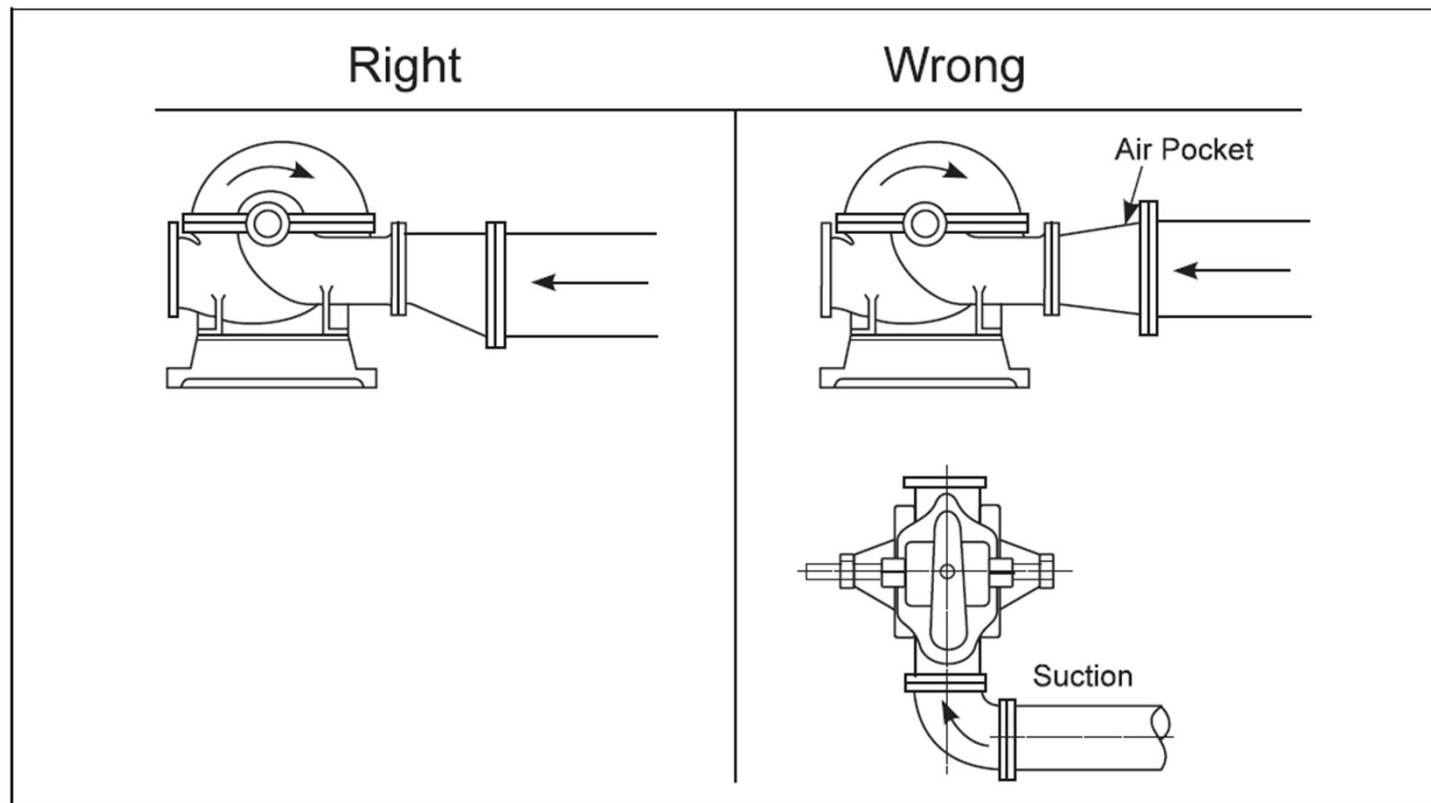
Right and wrong pump suction pipe arrangements
